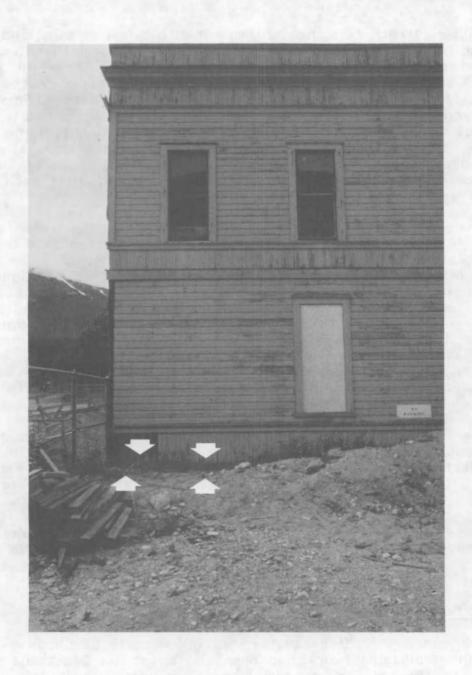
Photograph of location of Test Trench 19, at the southeast corner of the General Offices Building, looking west.
